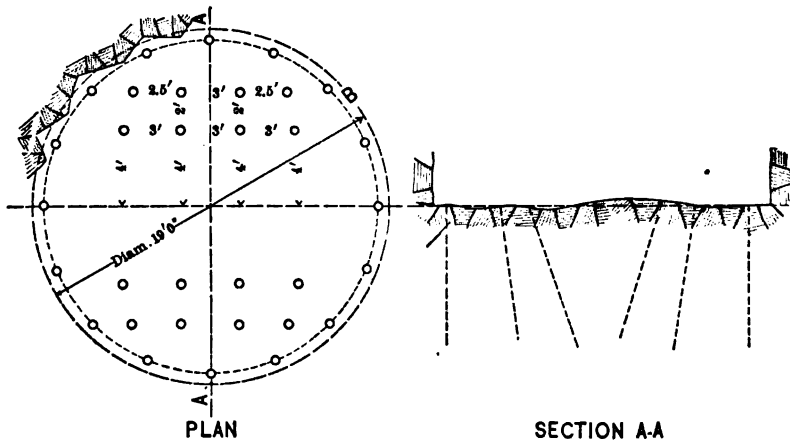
Contract 63. Arrangement of Drill Holes and Method for Sinking Shaft 3.
